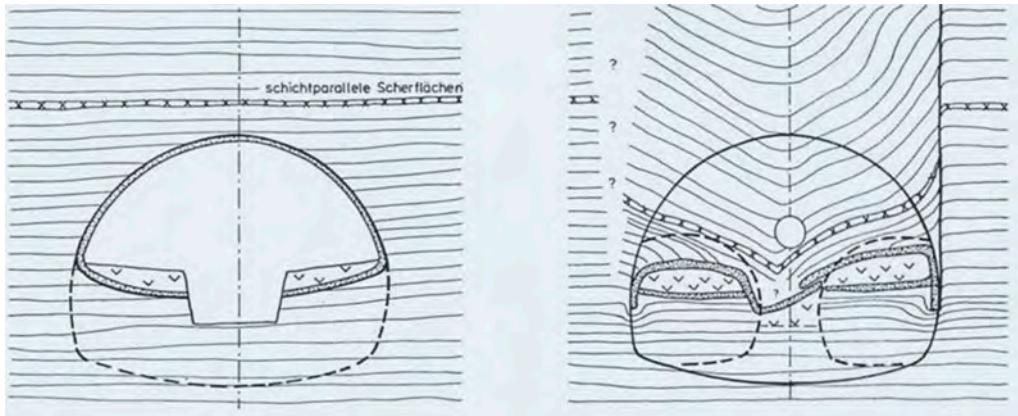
Tunnel cross section and rock strata before (left) and after collapse (right) at chainage 123.
